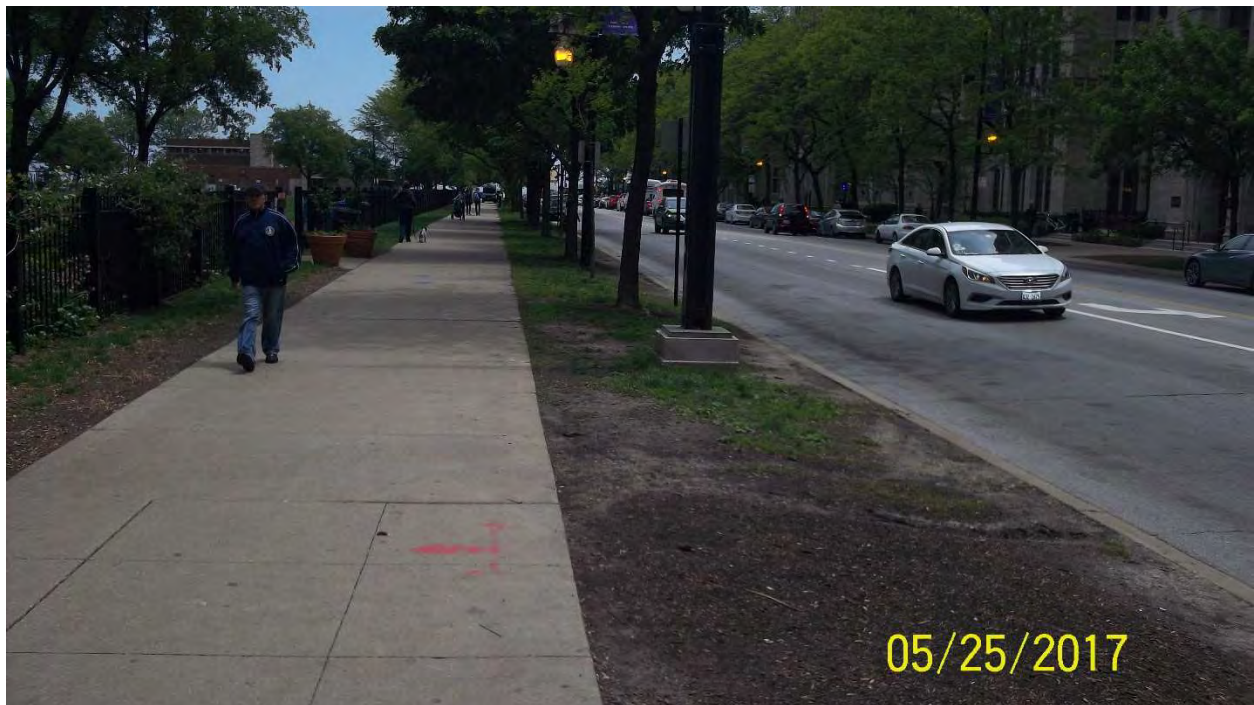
Northeast corner of Chicago Ave. / Fairbanks Ct. – Looking East
